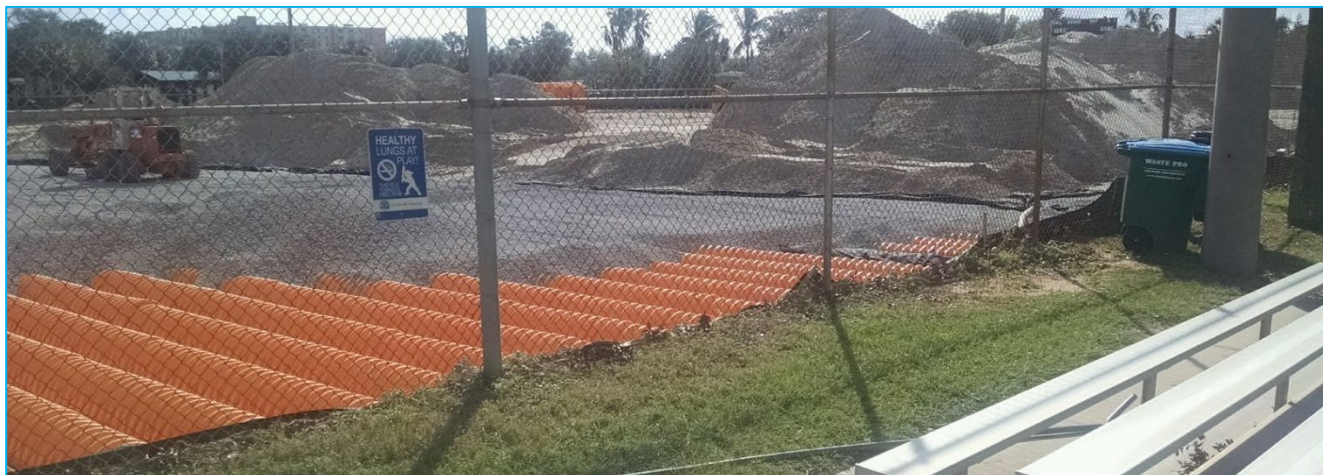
Stormwater exfiltration system under construction at Canaveral City Park in 2016.
